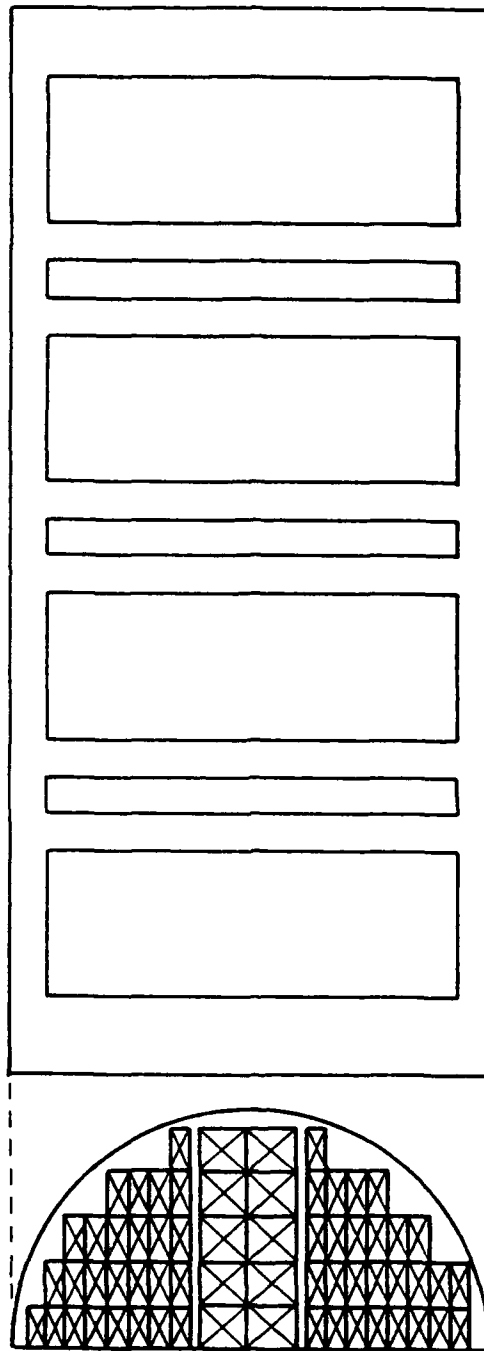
End Elevation and Plan Views of a Typical Magazine Showing a Proposed Stacking Arrangement.
